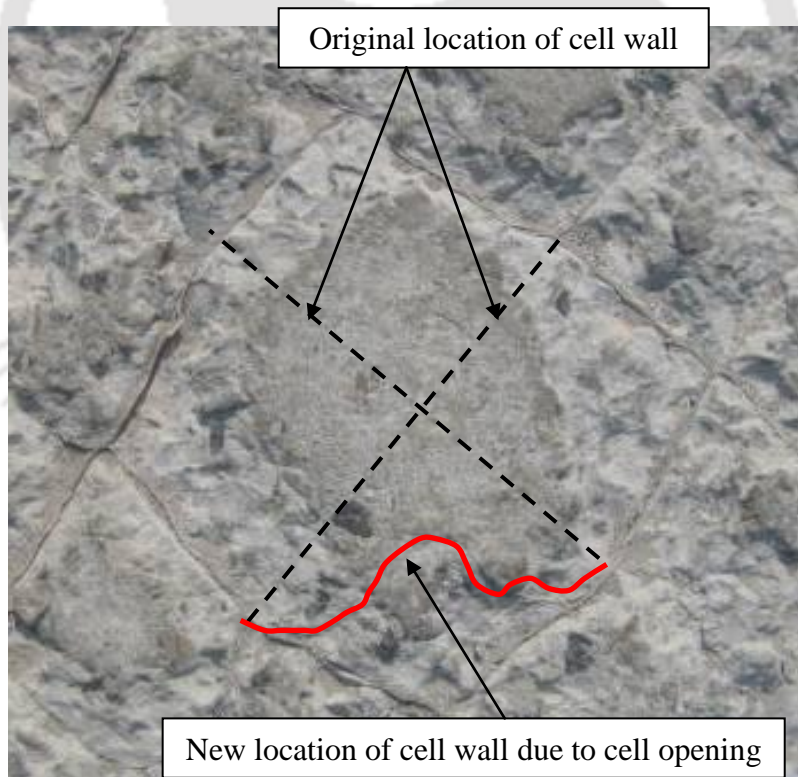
Cell opening in 100 mm thick PCCBP test section.
